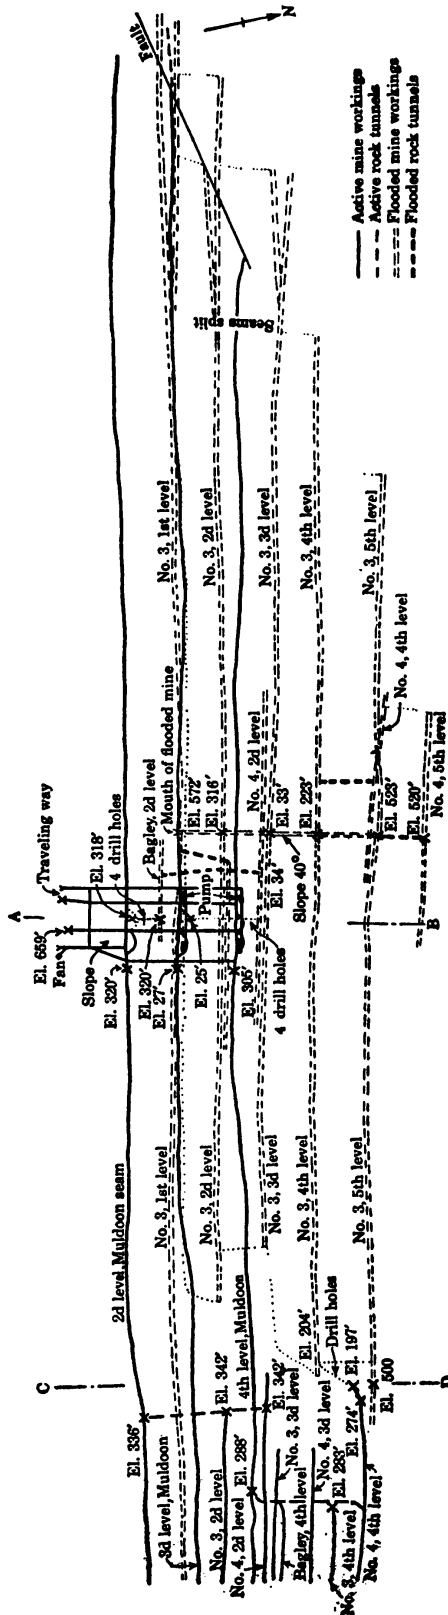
Plan of New Castle mine, King County, Wash.
